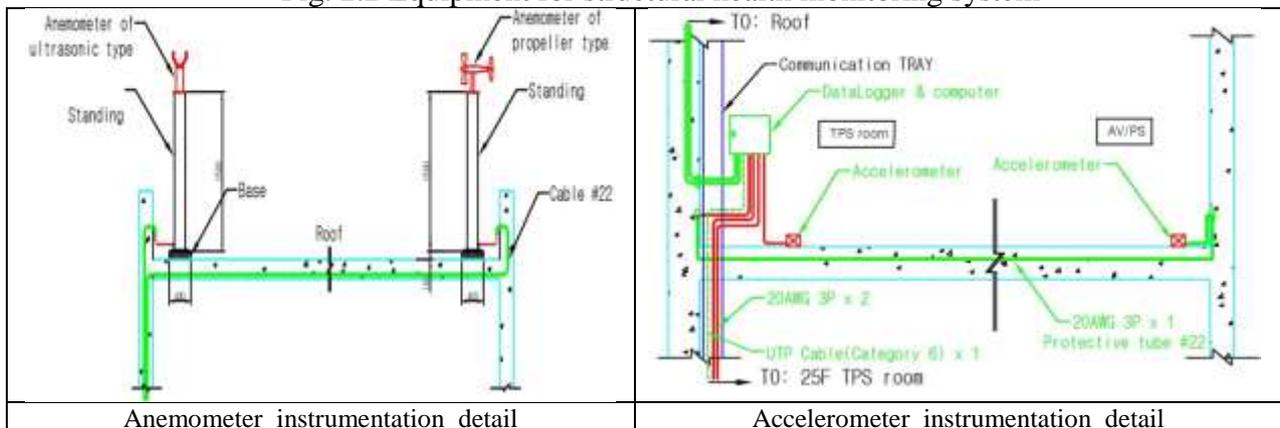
Instrumentation detail installed for Structural health monitoring system
